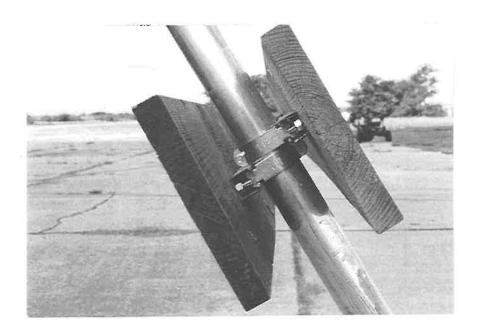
Typical aluminum sign support installation with attached soil plates prior to installation.
